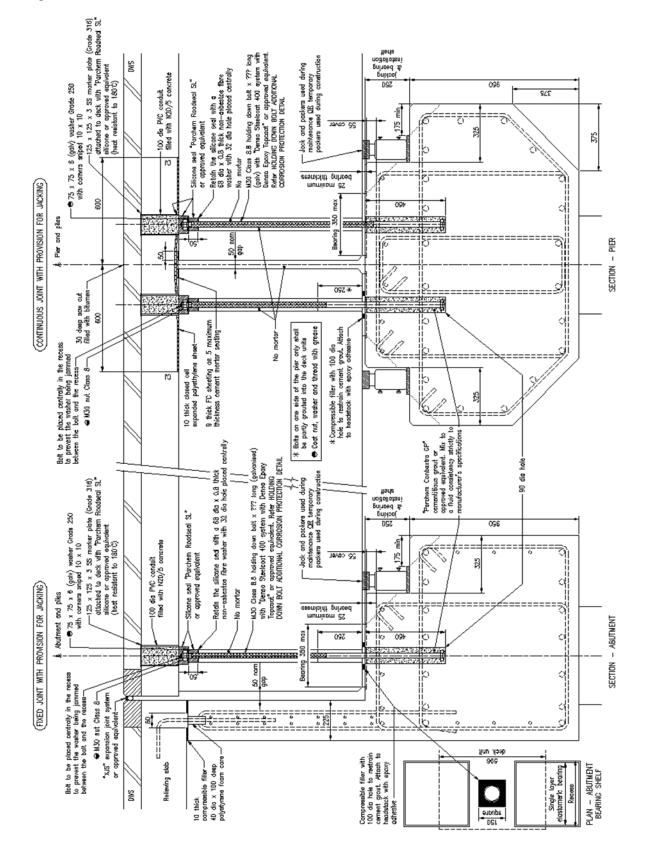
Fixed Abutment and Pier Joints – DWS and Concrete Deck on Deck Units
